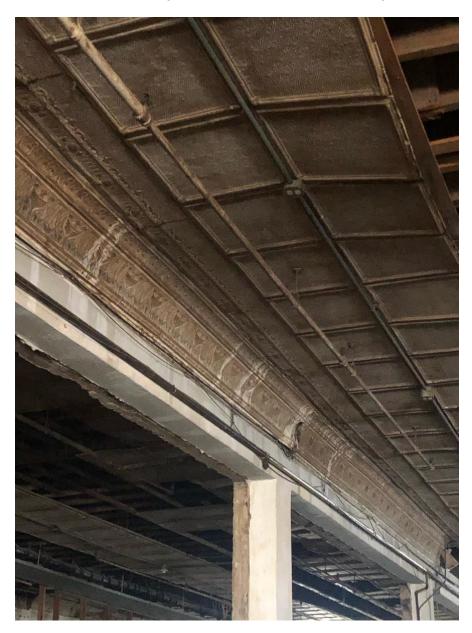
Fulwiler Building (159 Walnut St), Second Floor. View Northwest. March 24, 2021.
